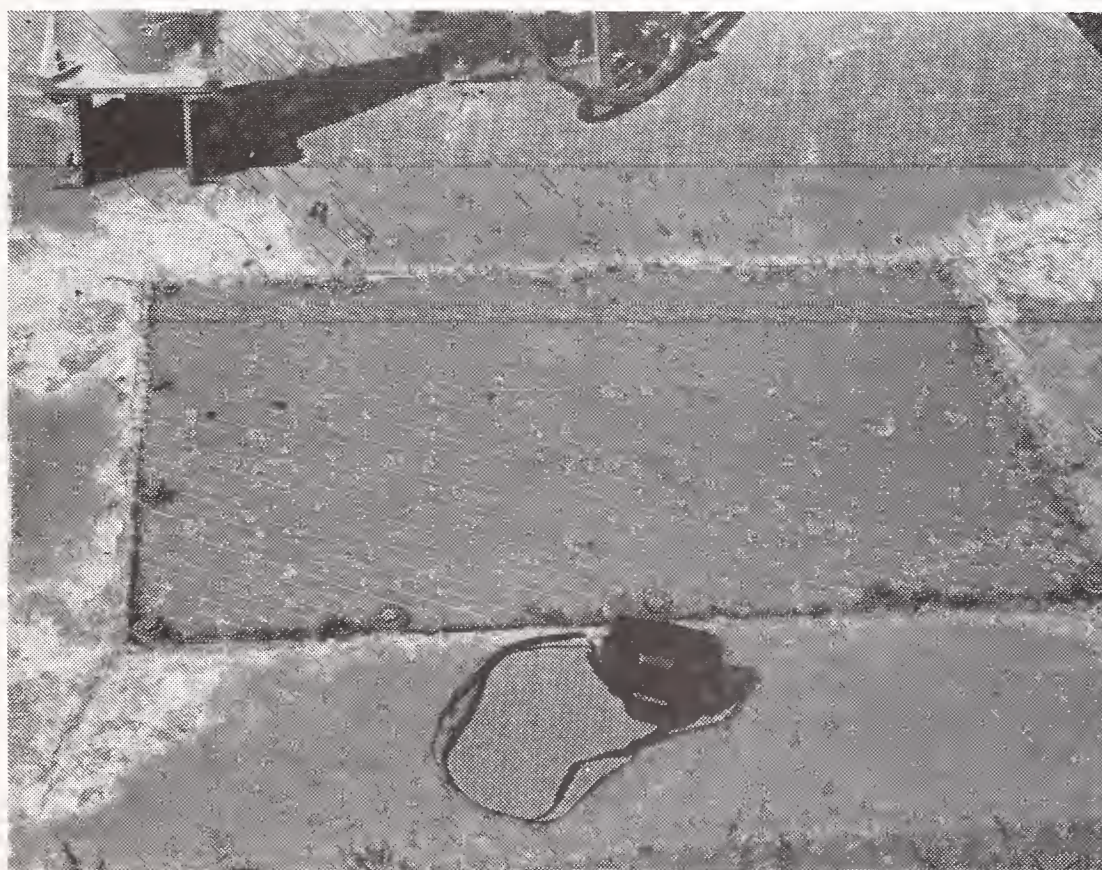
Top of pressure chamber. Minor cracking concrete radiating from pressure manhole.
